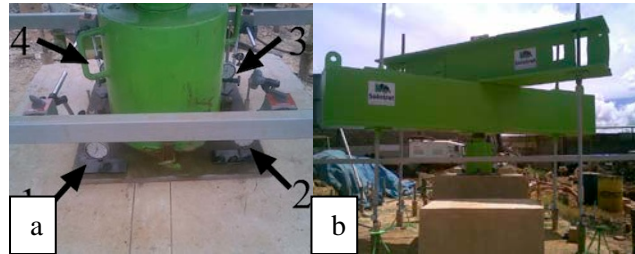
a. Mechanical deflectometers (1, 2, 3 and 4) installed in the base plate on hydraulic pump for the load test; b. Static piled-raft load
